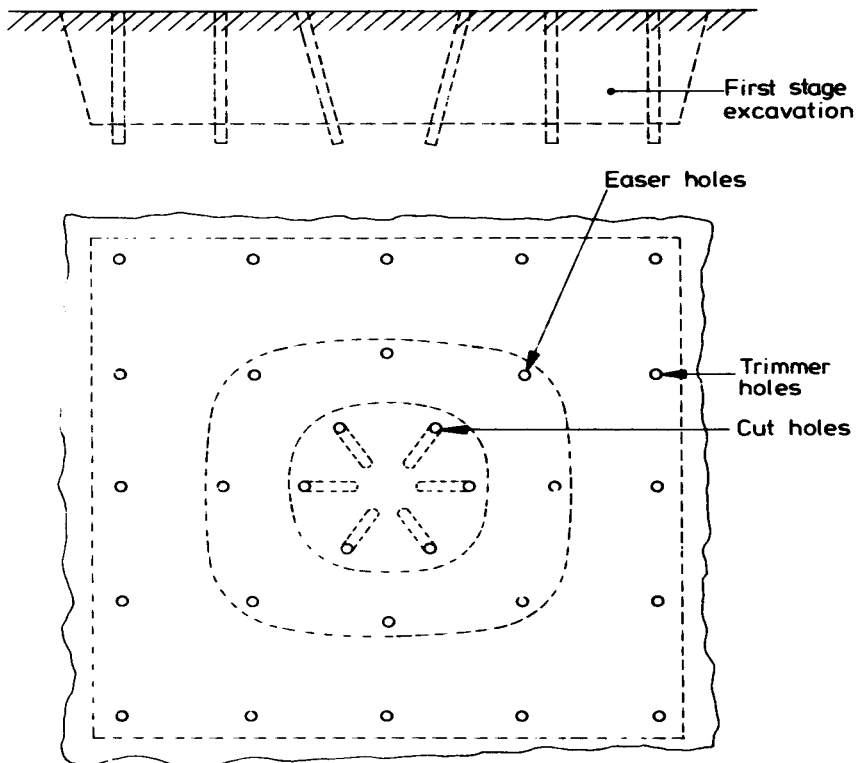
Rock excavation by drilling and blasting: pits and shafts
